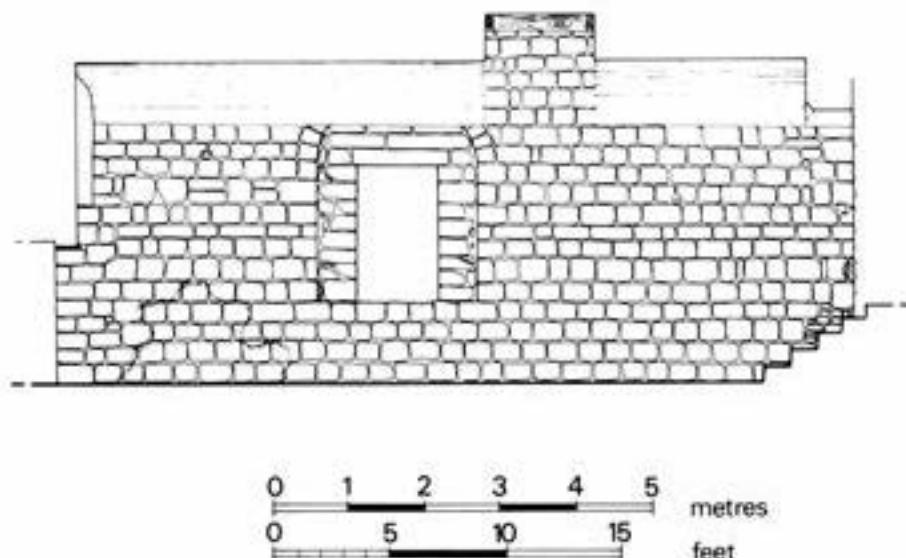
Elevation of the north wall of the ground floor passage (room 4)
